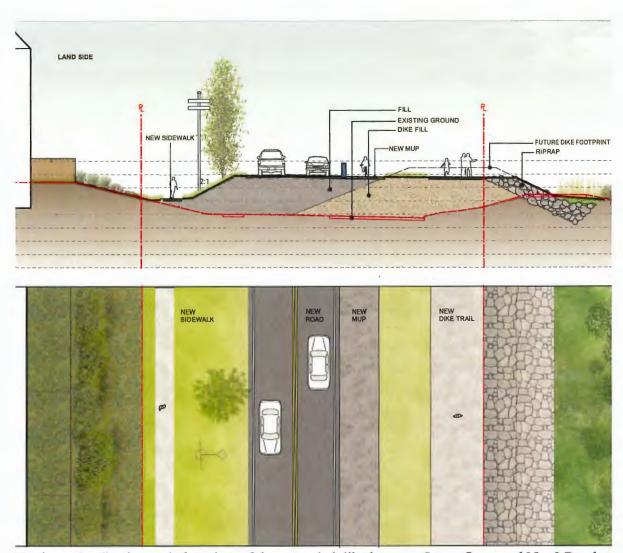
Section and plan view of the upgraded dike between Lynas Lane and No. 2 Road
